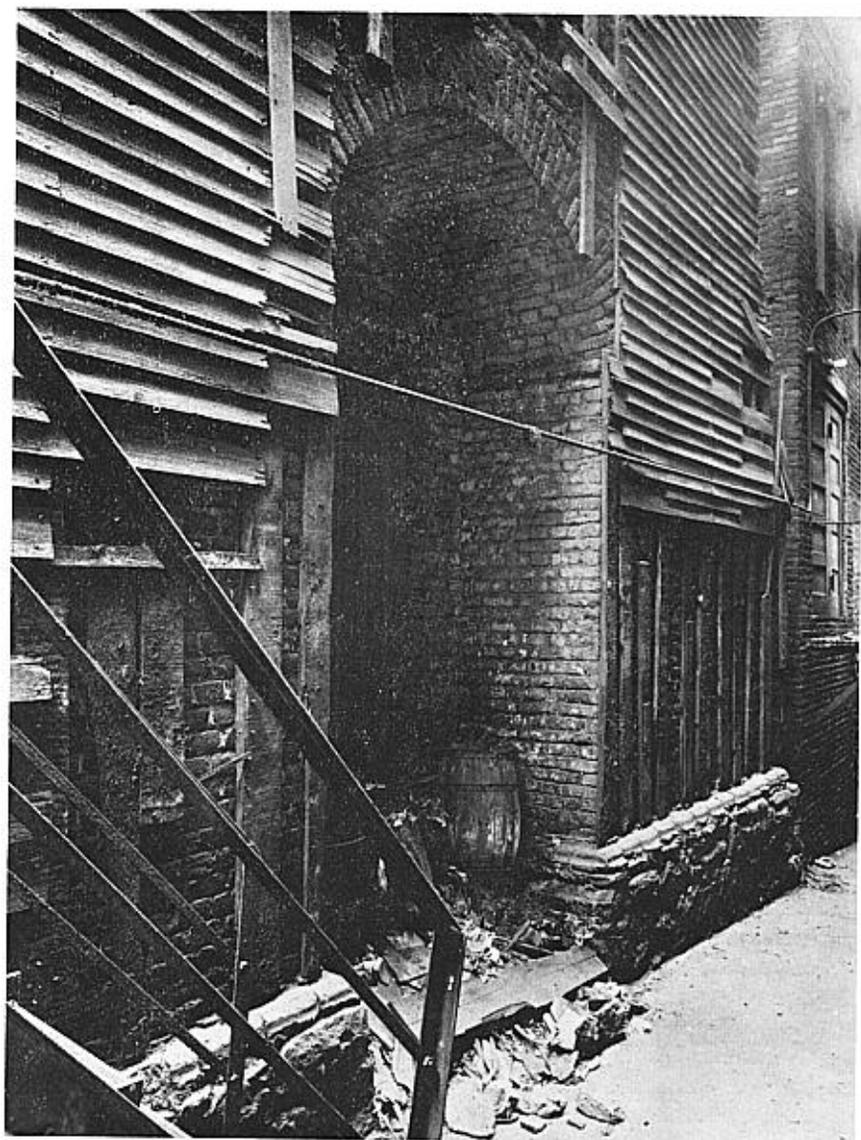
DETAIL OF THE NORTH WALL VIEWED FROM THE EAST
